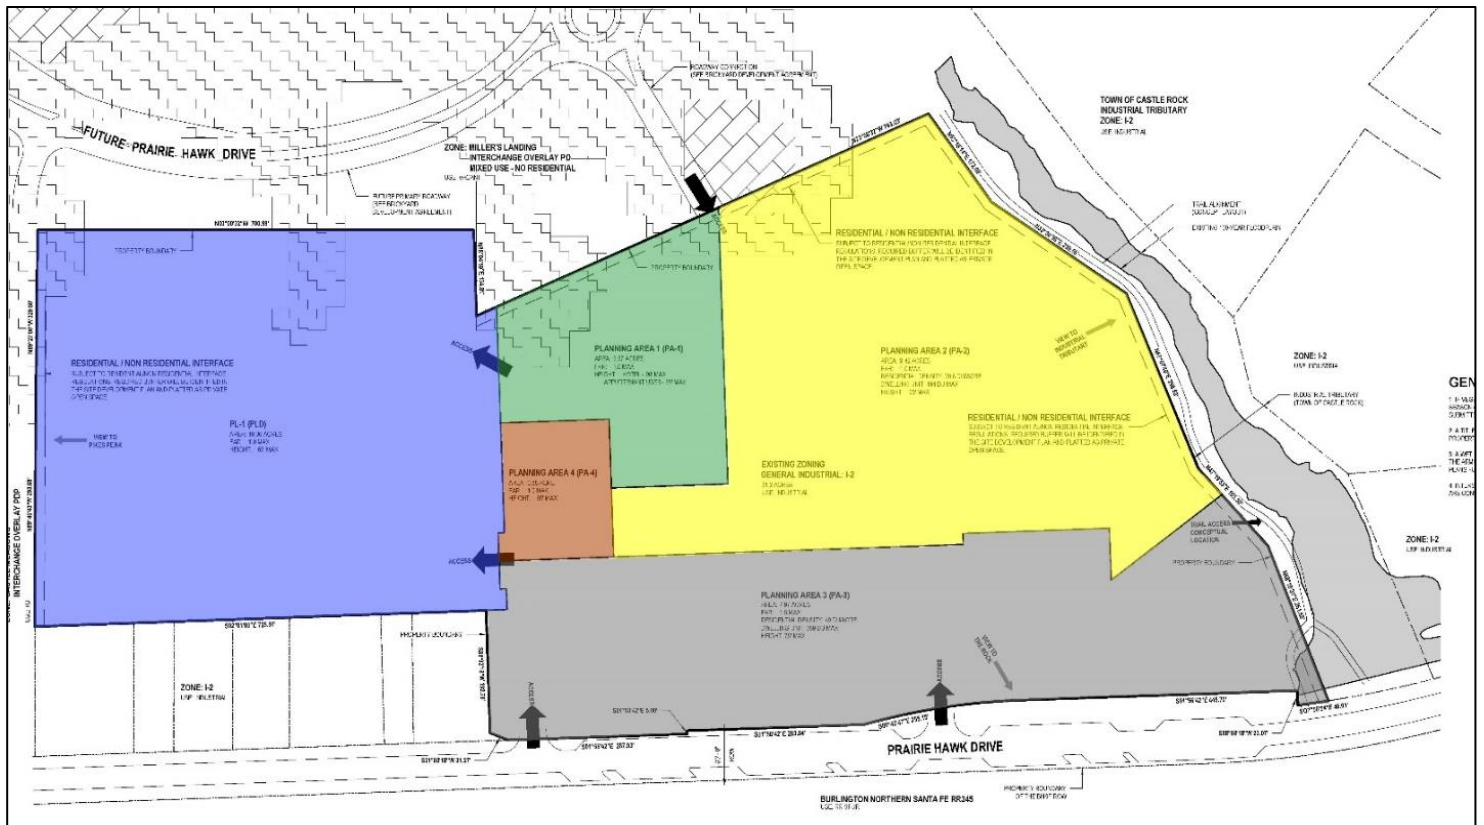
The Brickyard Plan Development Plan by Planning Areas
